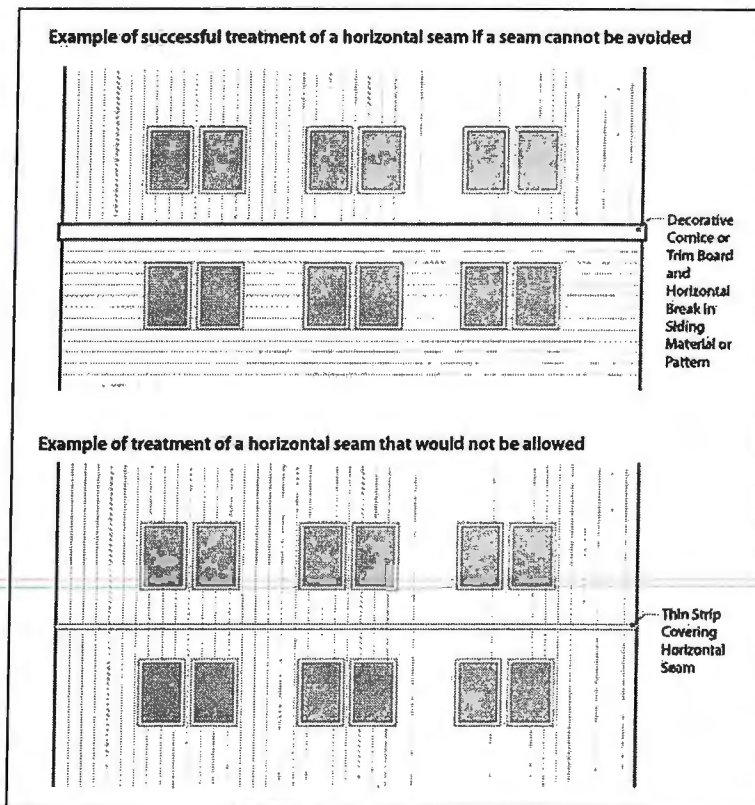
Exterior Walls – Horizontal Seam Treatment
